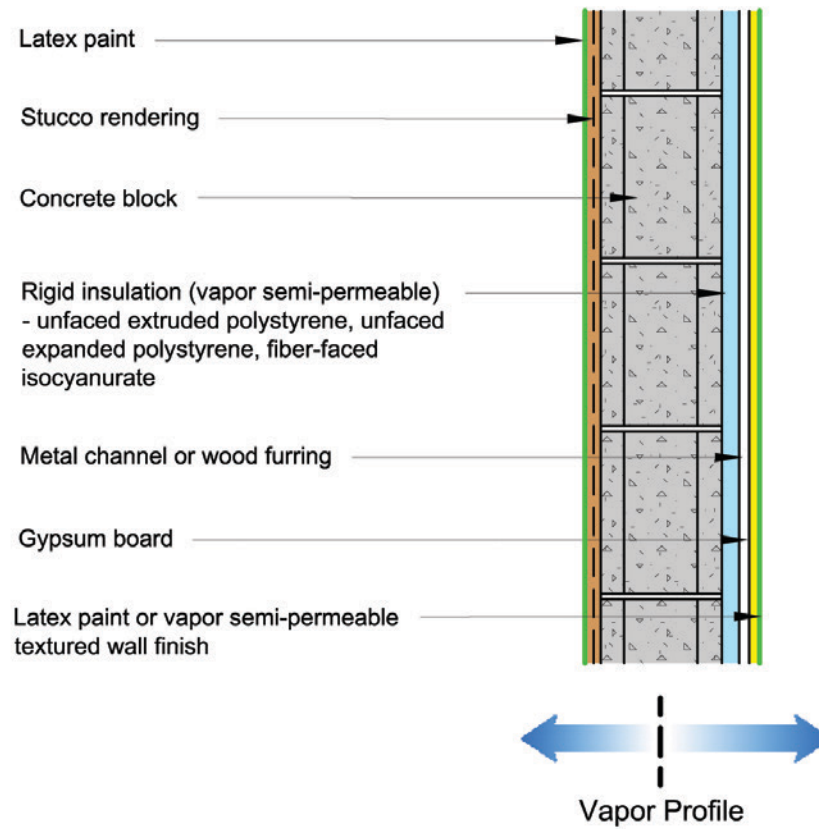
Concrete Block with Interior Rigid Insulation Frame Wall with Cavity Insulation and Stucco
